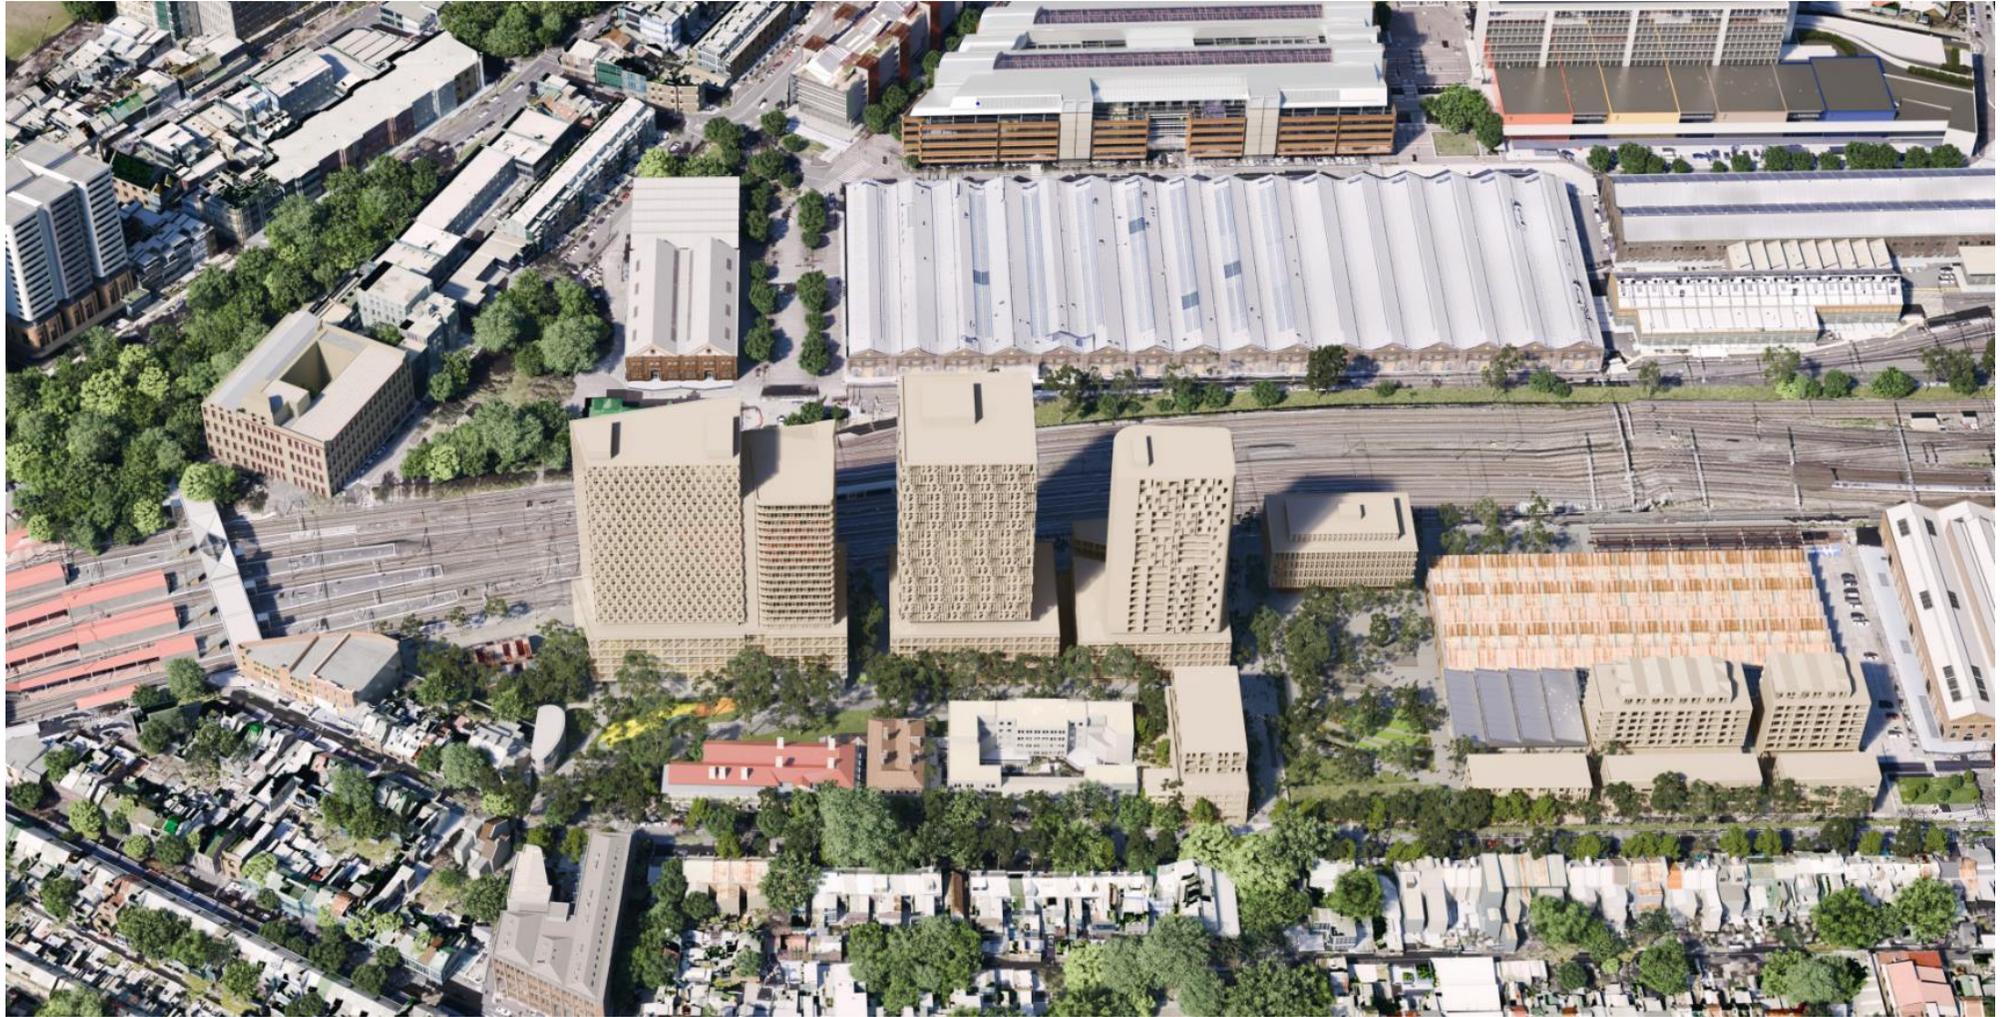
Amended TfNSW Proposal (Source: TfNSW)
